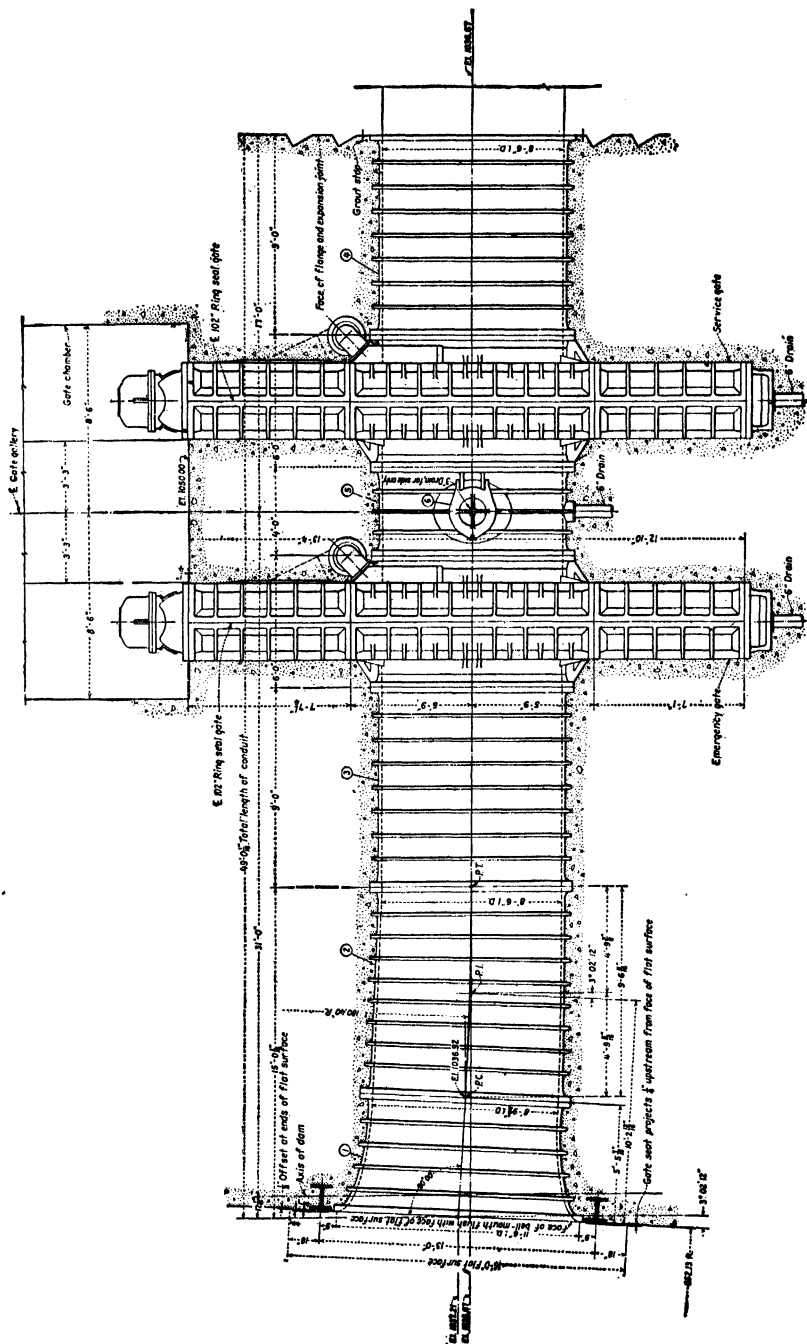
102-in. ring-seal emergency and service gates, with bellmouth inlet casting normal to sloping upstream face of dam, and connected to horizontal run of conduit lining by a long-radius elbow. Forty of these gates operate under 250-ft head at Grand Coulee Dam.
